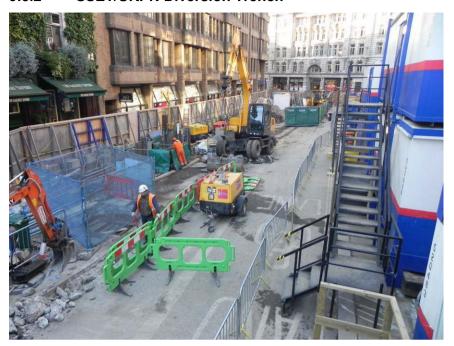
Liverpool Street site, Pile Line GENERAL WATCHING BRIEF Pits 9 and 10 (centre left) and SSET/UKPN Diversion Trench (across the compound east to west, parallel with green barriers), looking west.
